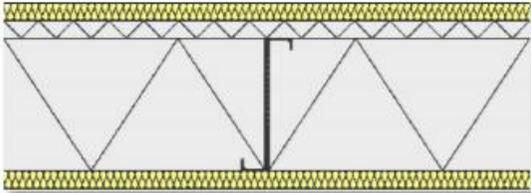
ELEMENTUM Eco AB steel profile wall construction (Elementum, 2017)
